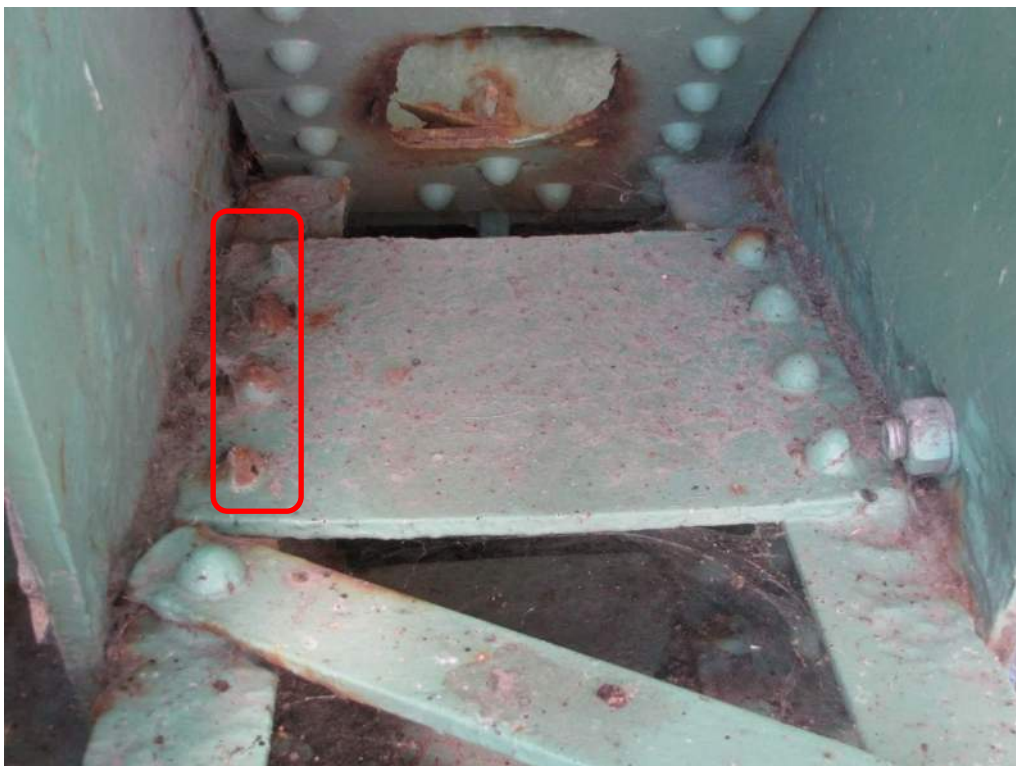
4 rivet heads have 90-100% section loss in tower truss member 15N-18N near node 15N. Note the bottom flange at this location has an area of 100% section loss (not shown).
